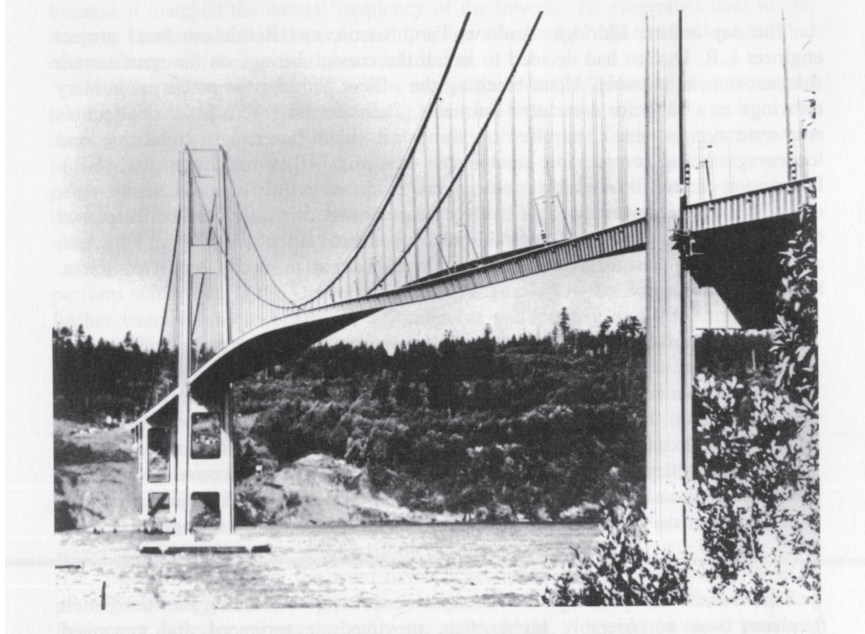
Twisting of Tacoma Narrows Bridge just prior to failure.
